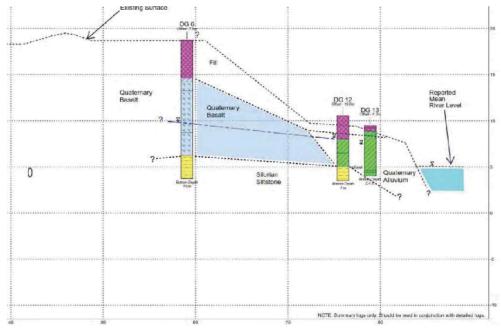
Cross Section C-2 Extract (see Appendix B for full cross section drawing)
